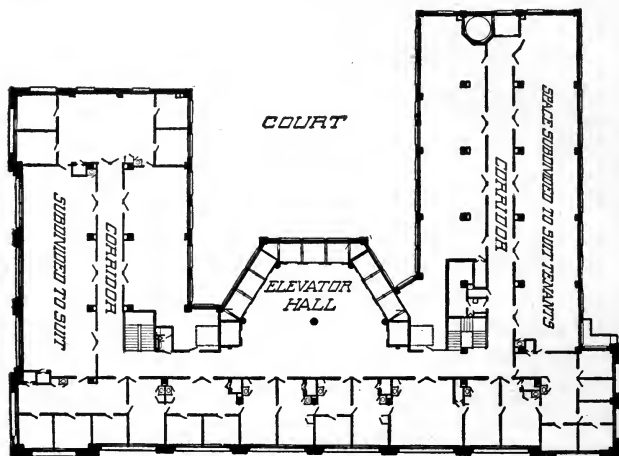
Marquette Building, Chicago. Typical Office-floor Plan.
